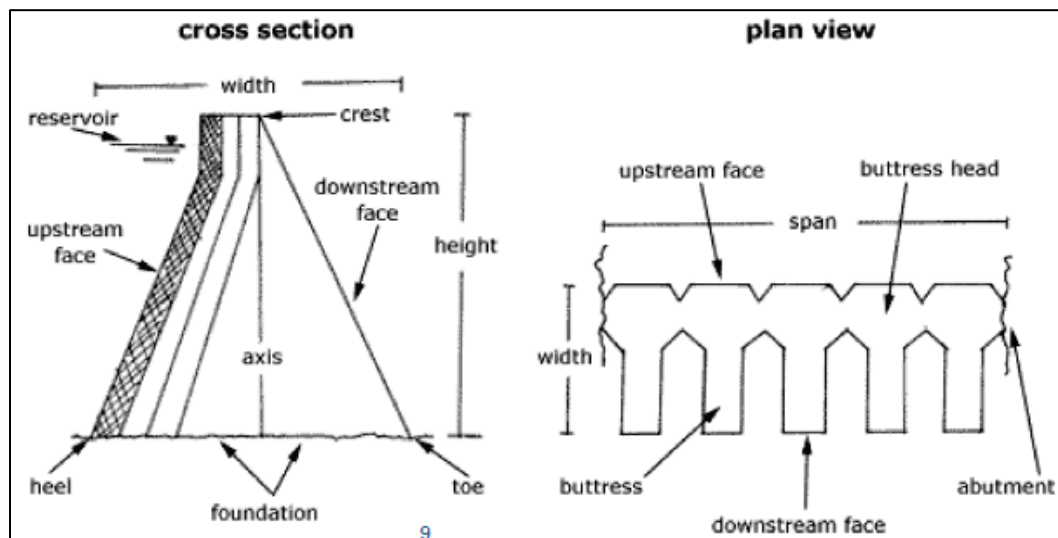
Concrete buttress dam plan and profile views (USFS and FEMA 2016).
